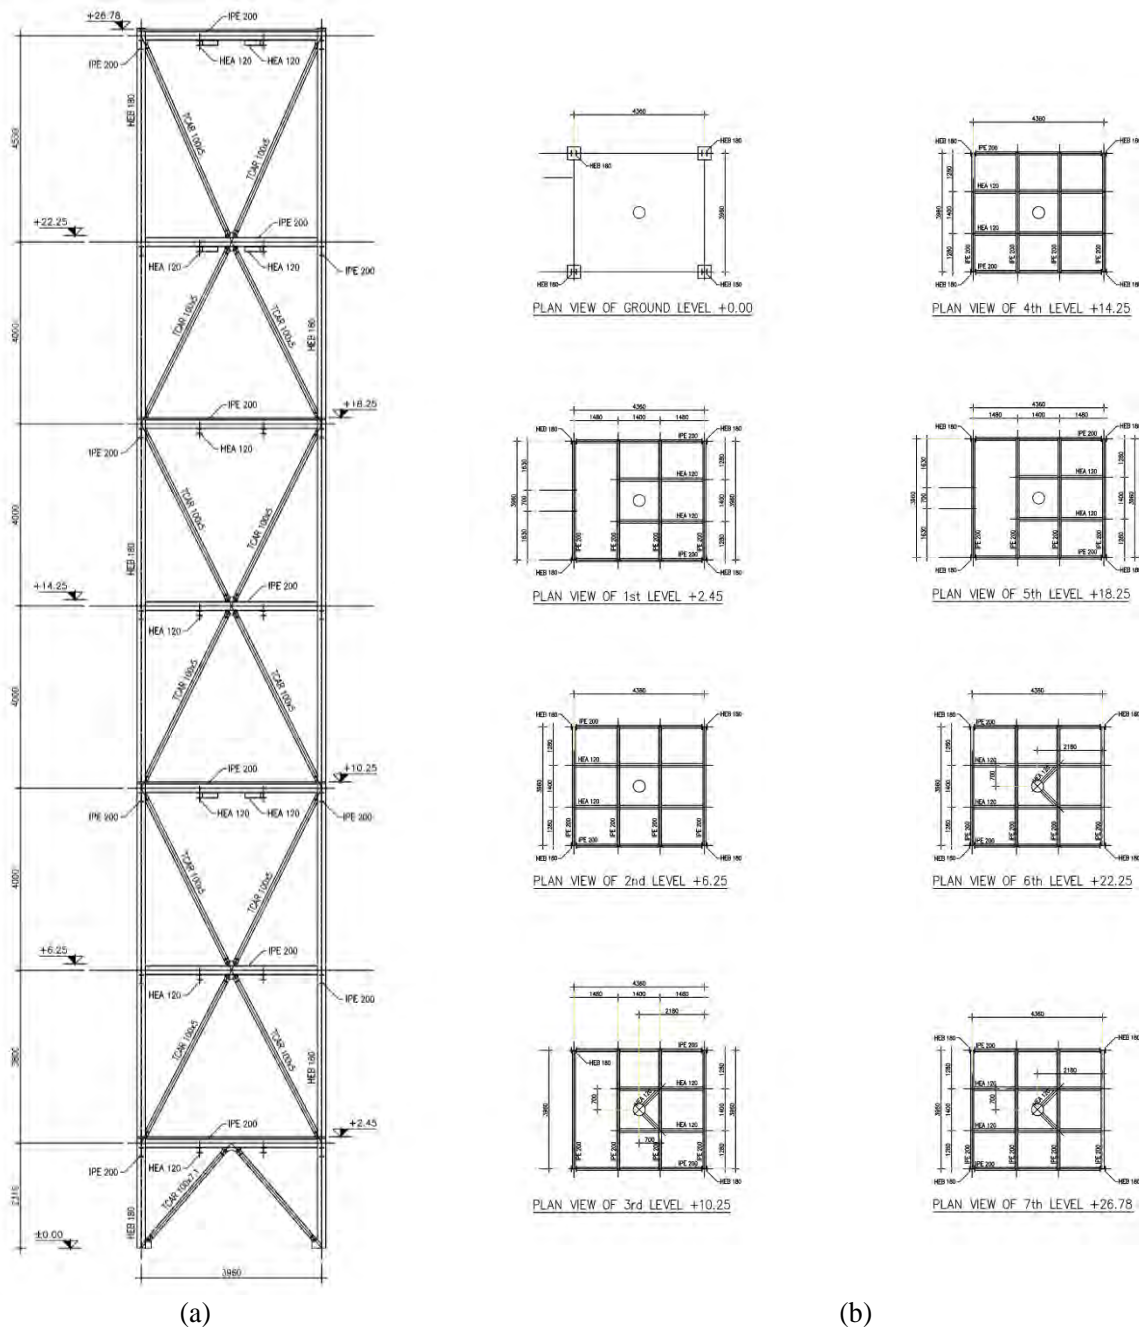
(a)Section of the tower; (b)Plan views of the elevations.
